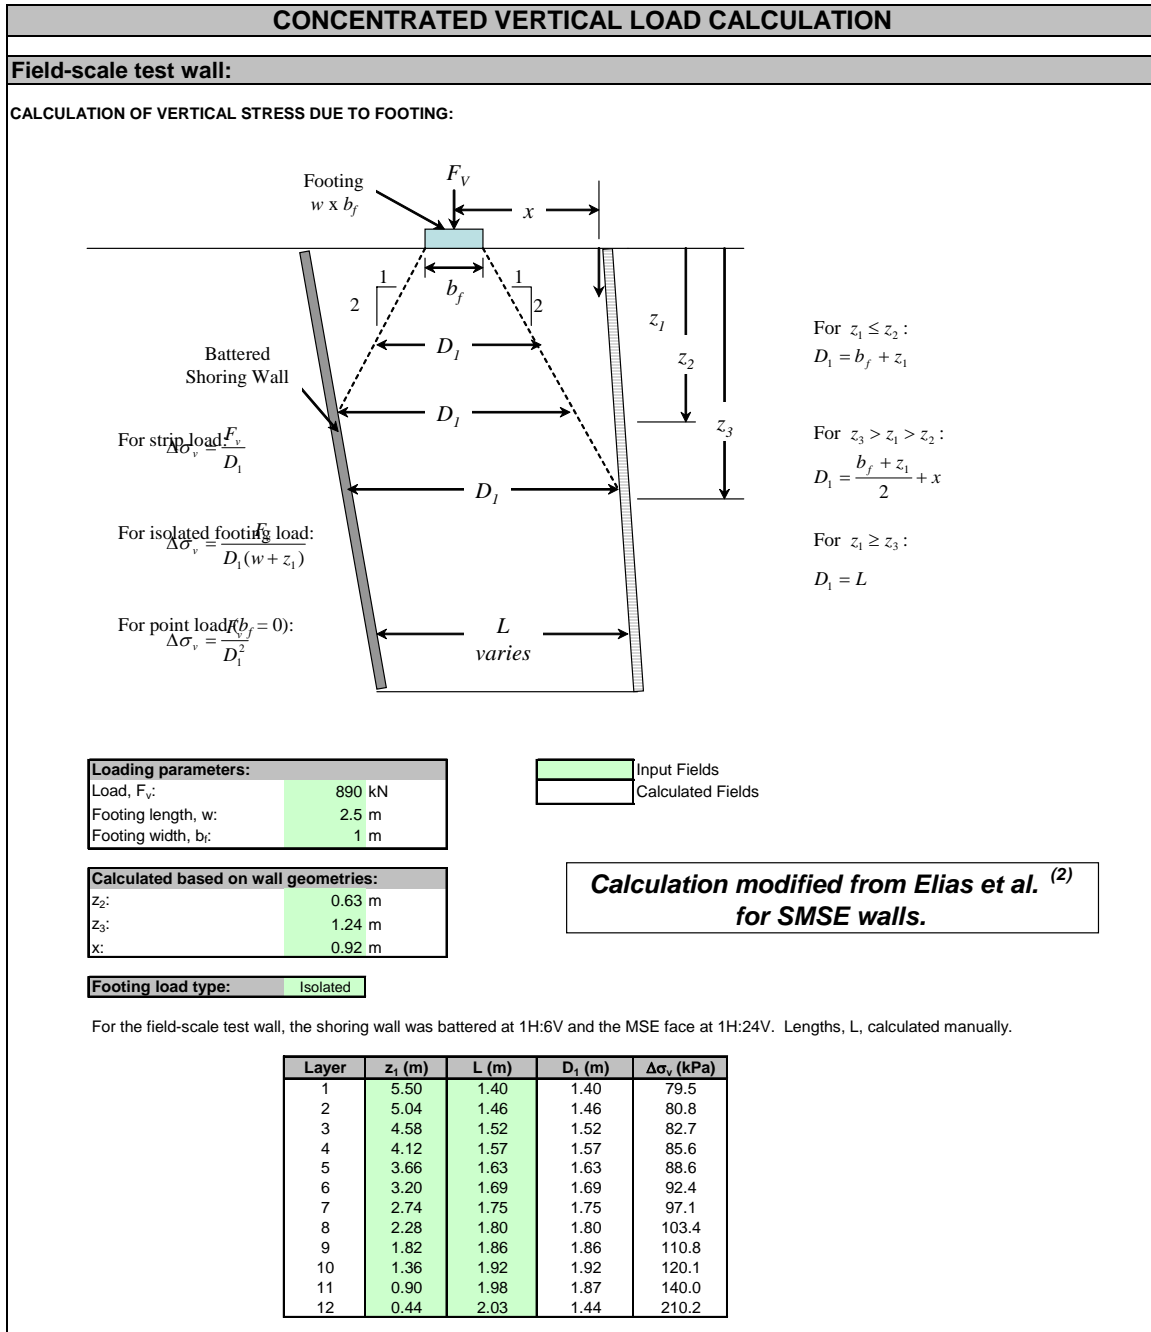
Calculation. Calculation of vertical stress due to footing load for test wall.
